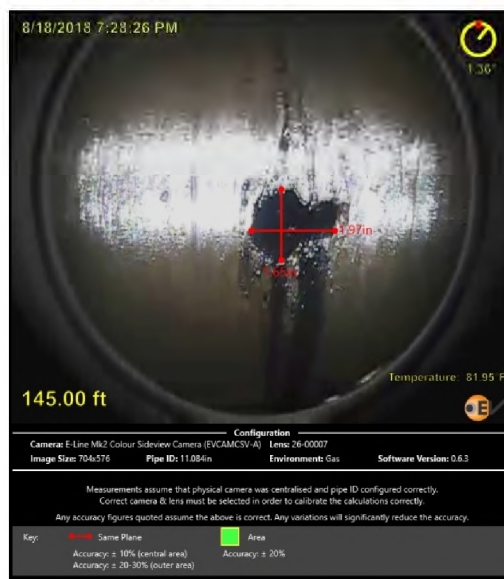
Picture of Hole in 11 3/4 in Casing with Dimensions from Video Imaging at 145 ft
